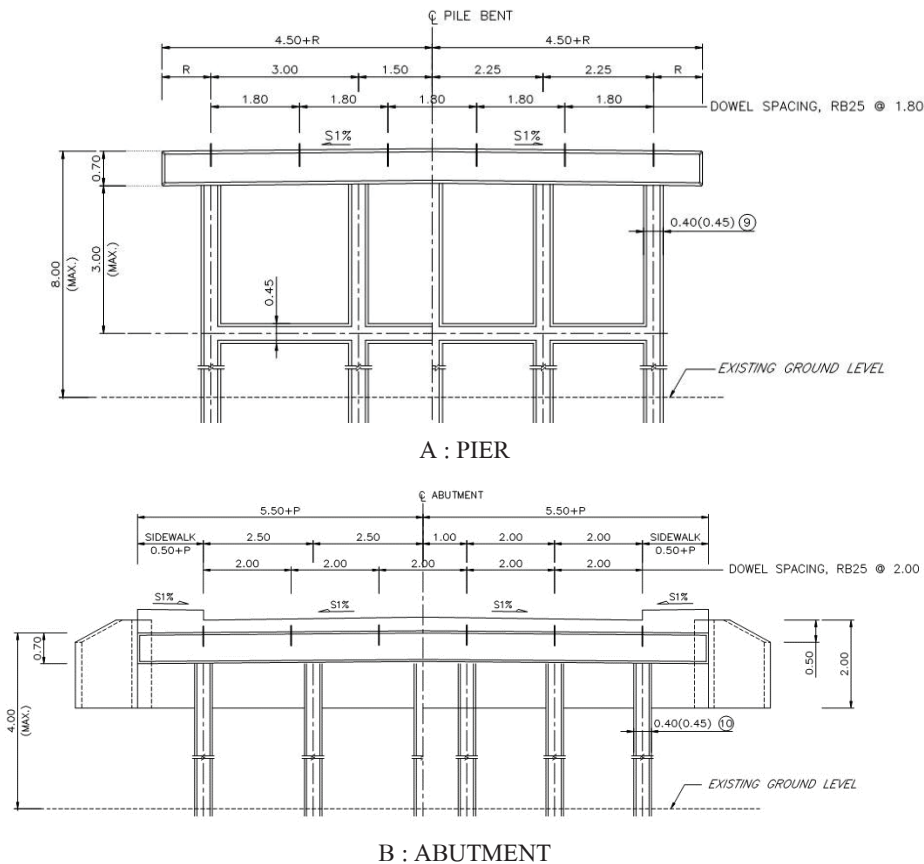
PIER & ABUTMENT FOR SUBSTRUCTURE
